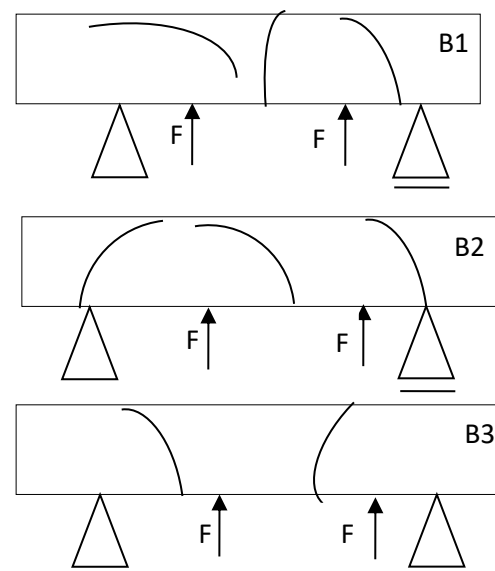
The location of cracks in slightly reinforced steel concretes
